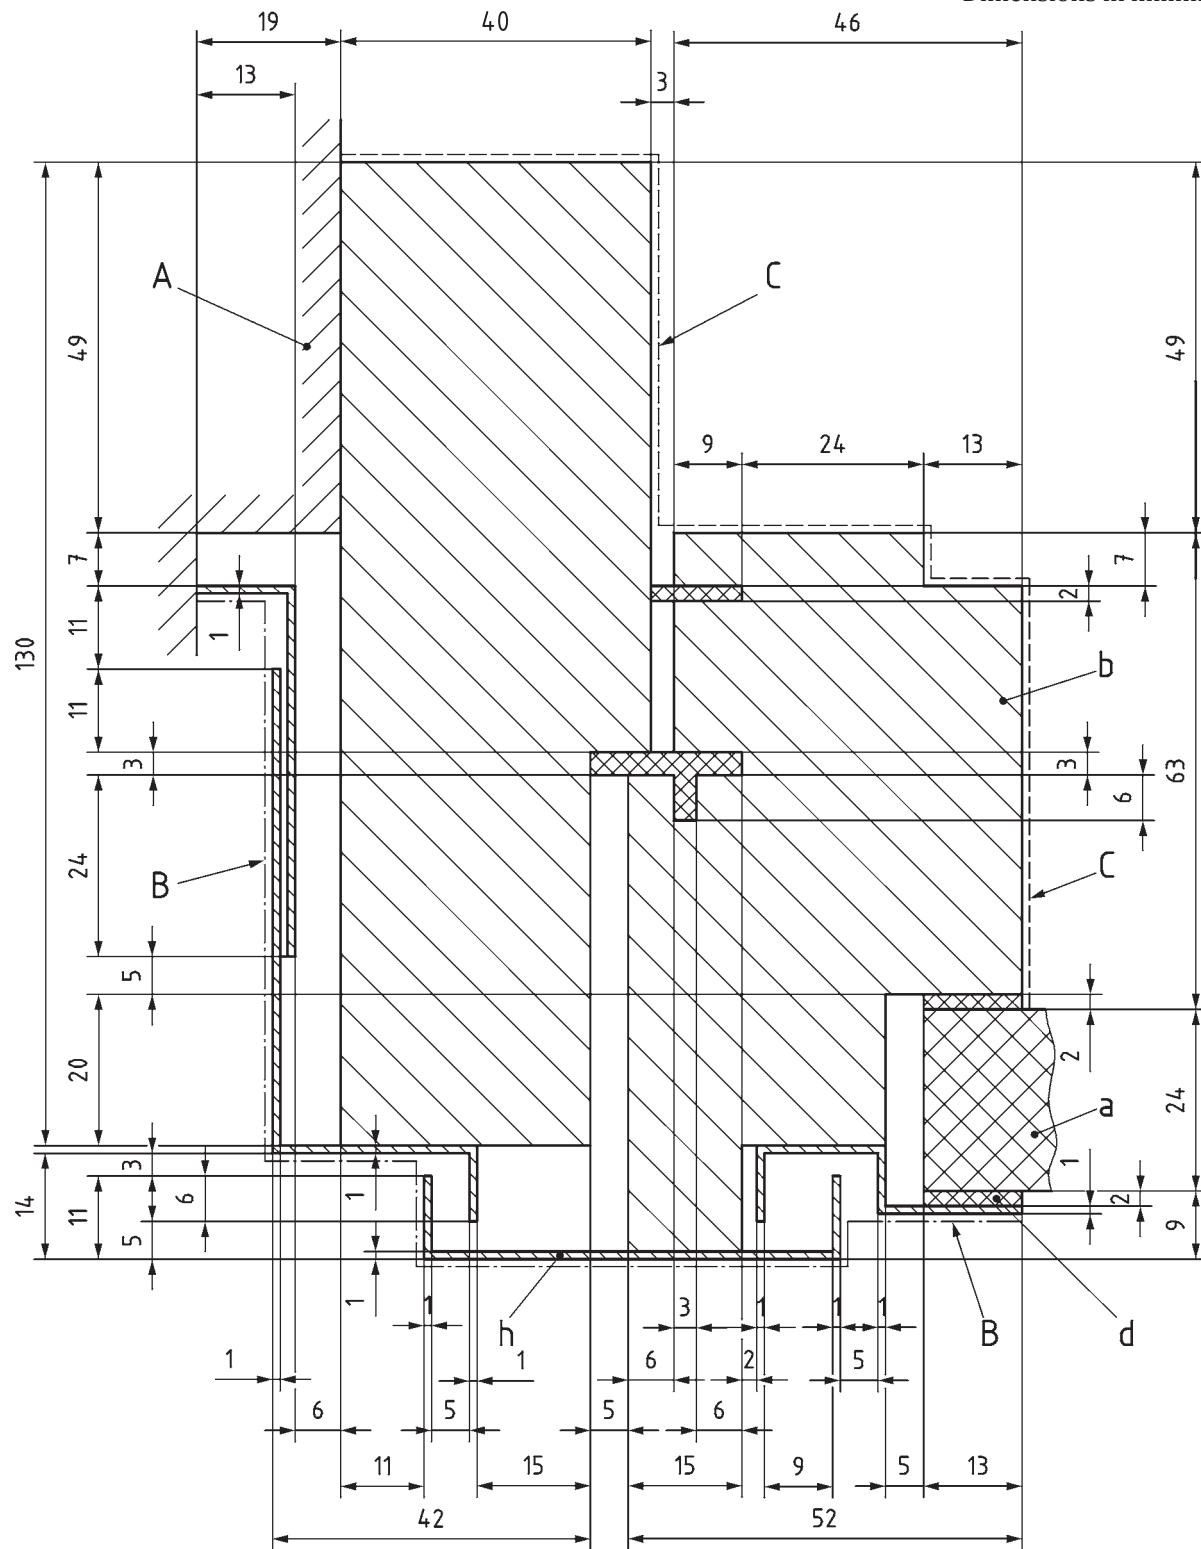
PVC-frame section with steel reinforcement and insulation panel
